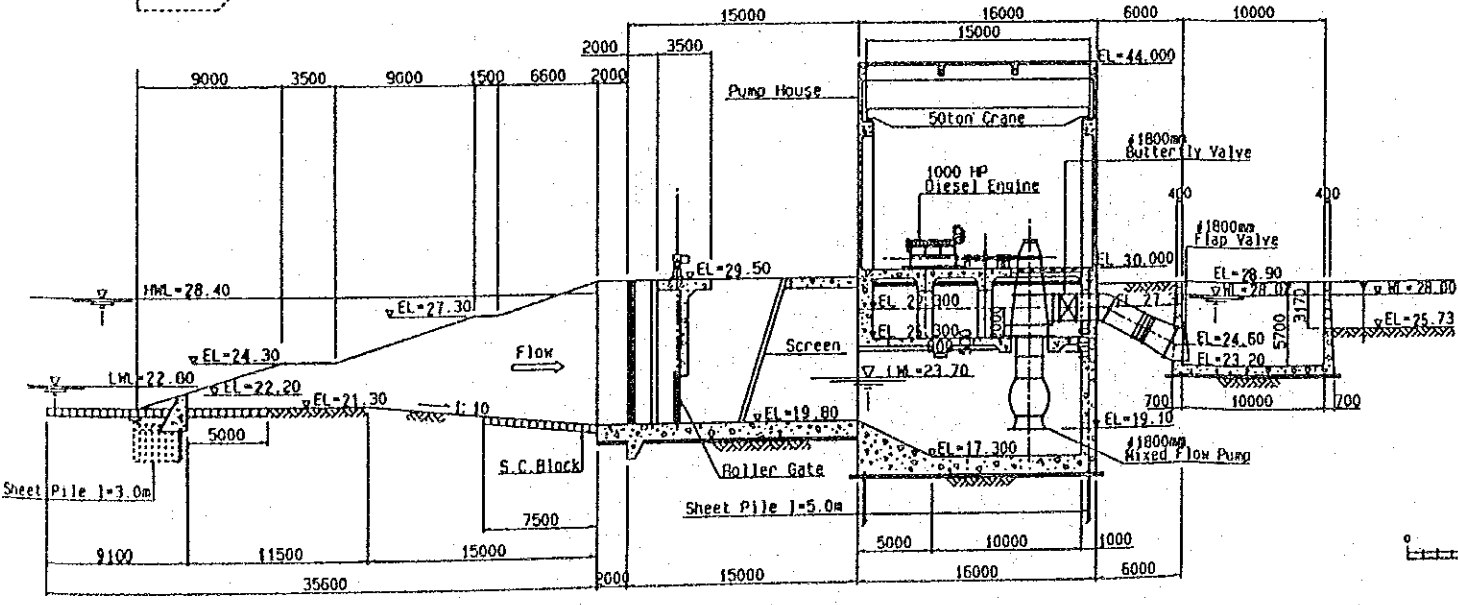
GENERAL PLAN OF ALTERNATIVE -6
